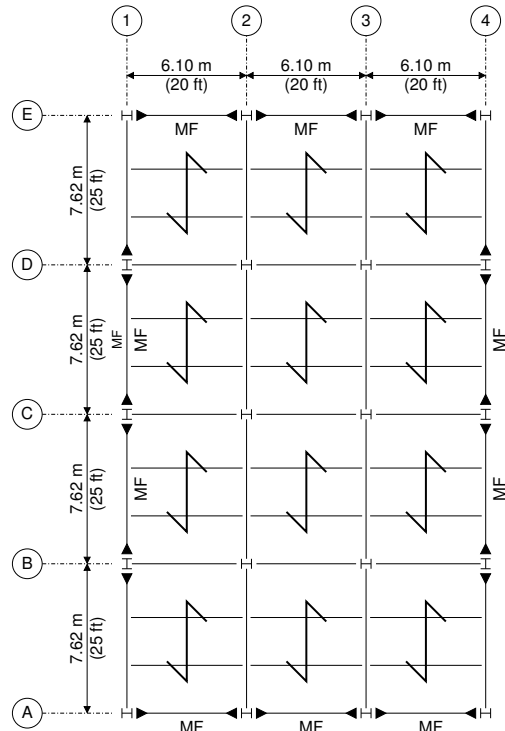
Typical floor plan of the building under study. Moment-resisting beam-to-column connections are indicated by solid black triangles.
